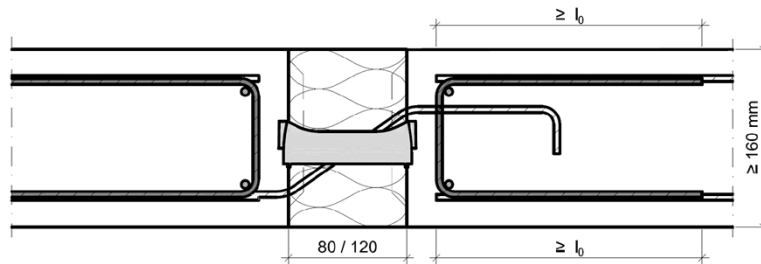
Example of Schöck Isokorb® Type Q with CCE (or SCE) and shear force bar  $\varnothing$  6 mm with shortened bar ends and with stirrups  $\geq$  8 mm according to section D.1.2.8
